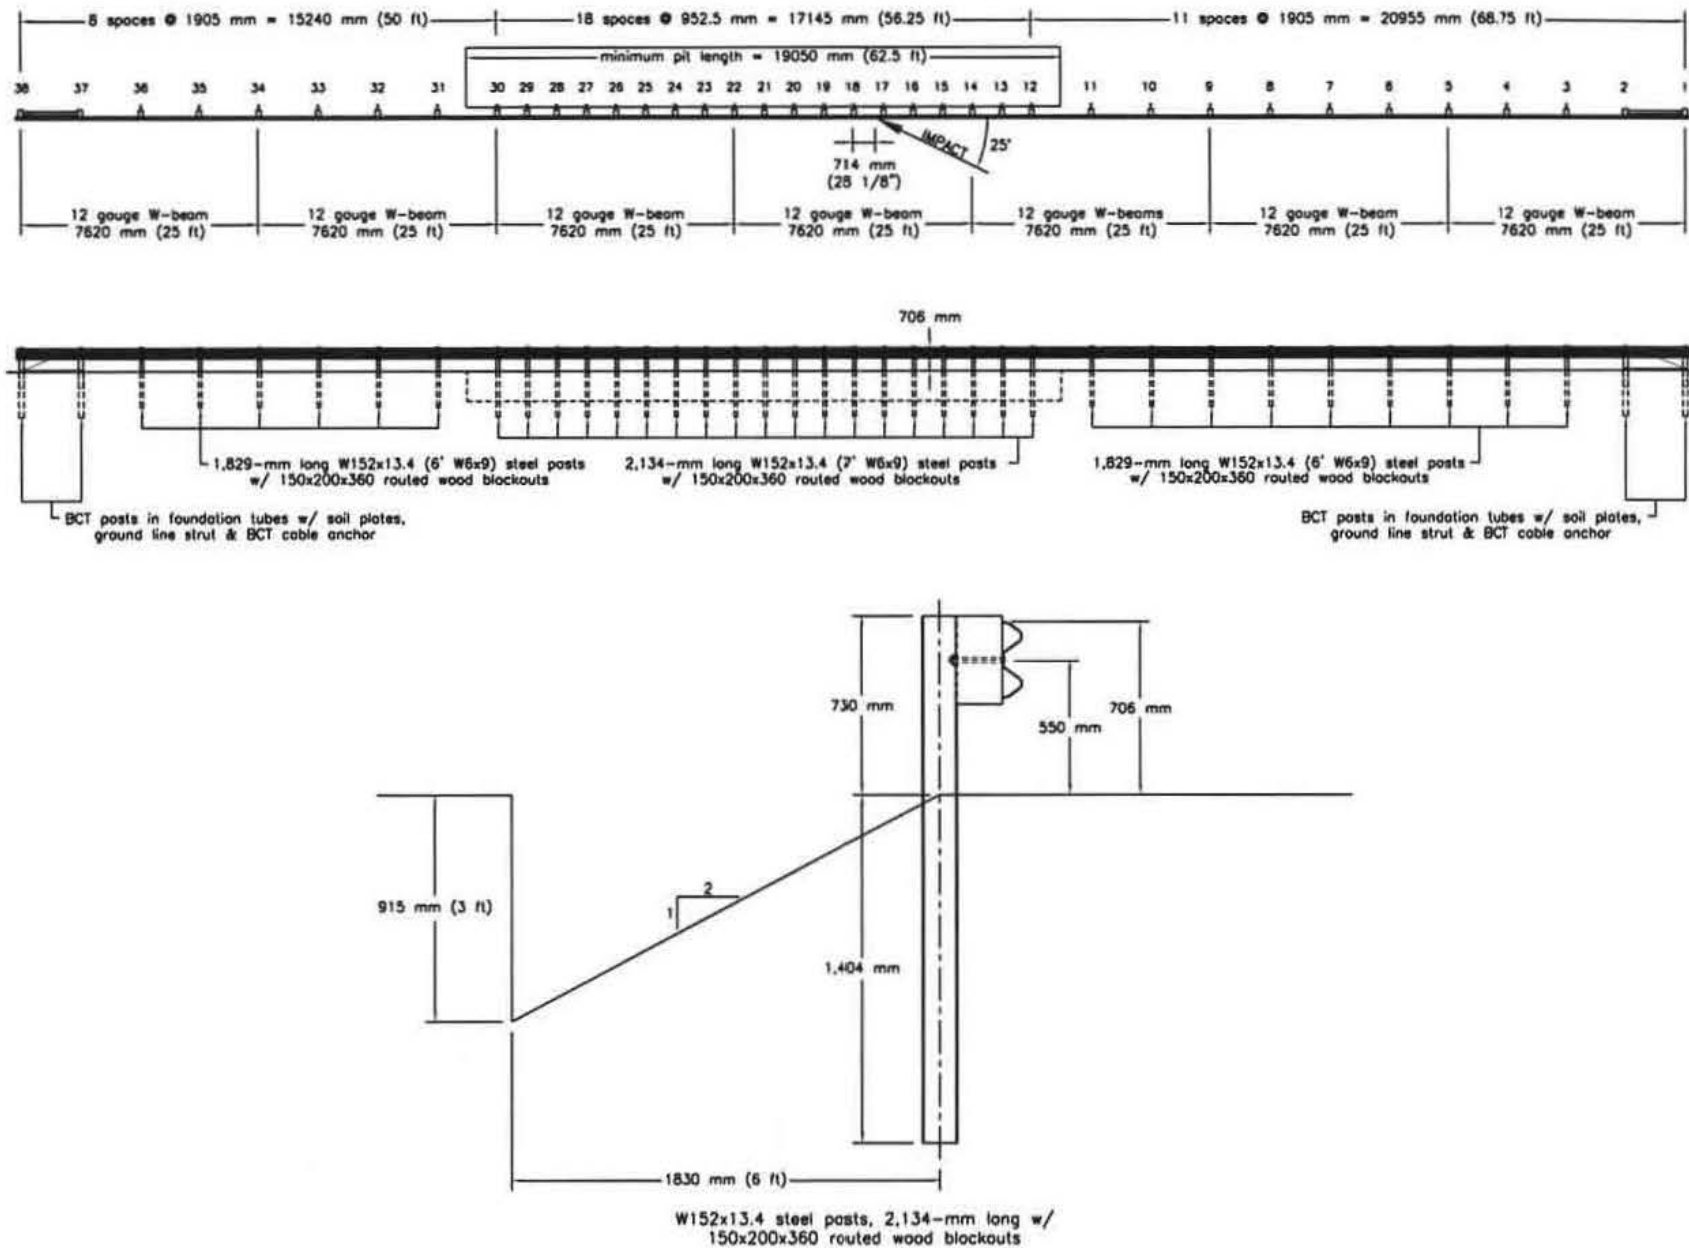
W-beam Guardrail Adjacent to a 2:1 Foreslope System
